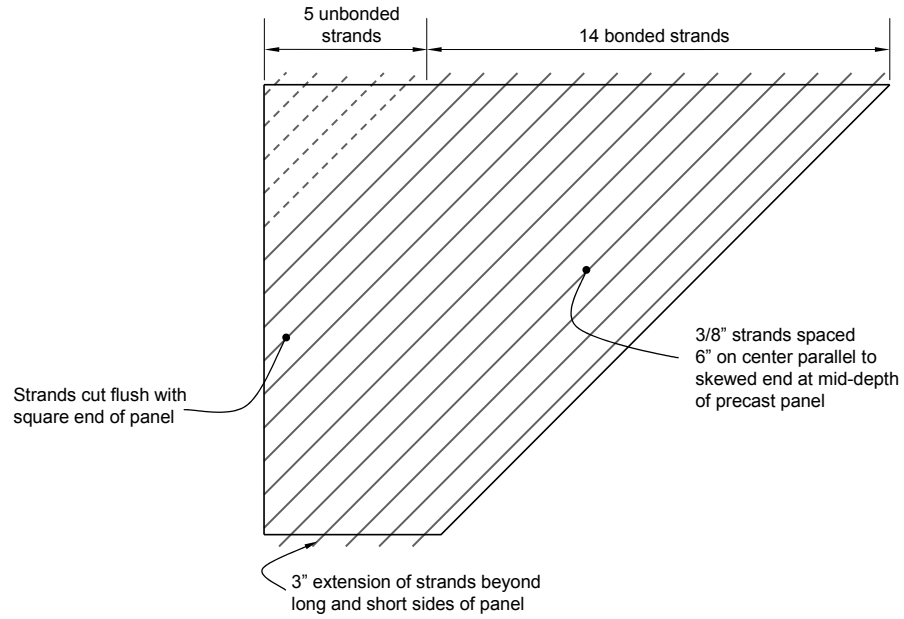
Layout of Prestressing Strands in PC Panel with 45° Skew
